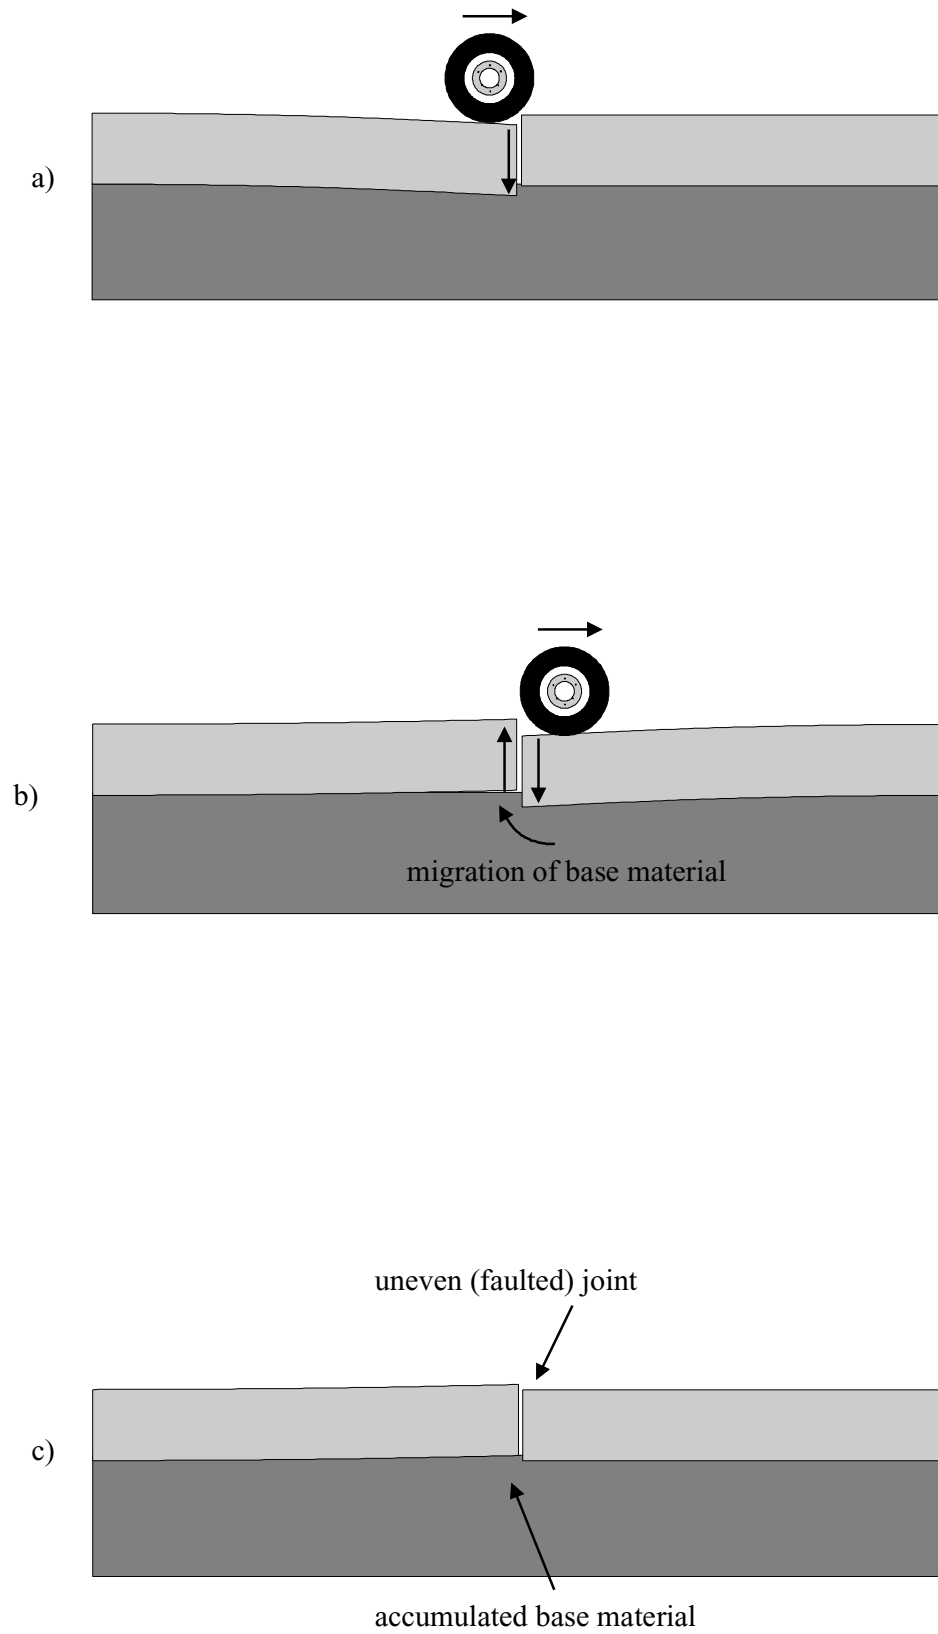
Schematic representation of faulting distress mechanism in rigid pavements.
